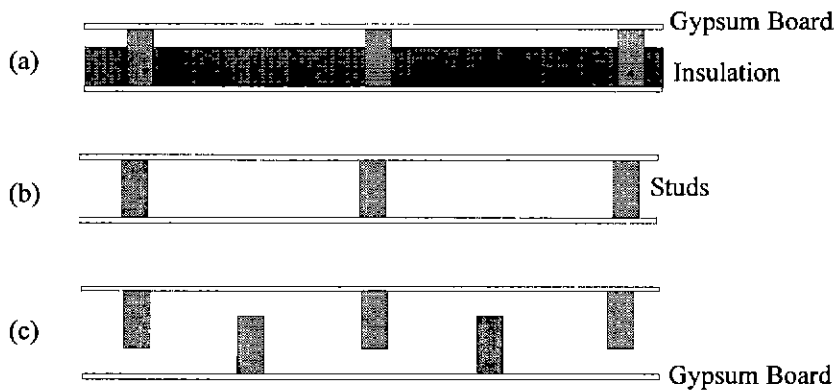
Range of Light-Timber Framed Wall Sections for Heat Transfer Modelling: (a) Ordinary Insulated Stud Wall. (b) Uninsulated Ordinary Stud Wall. (c) Uninsulated Staggered Stud Wall.
